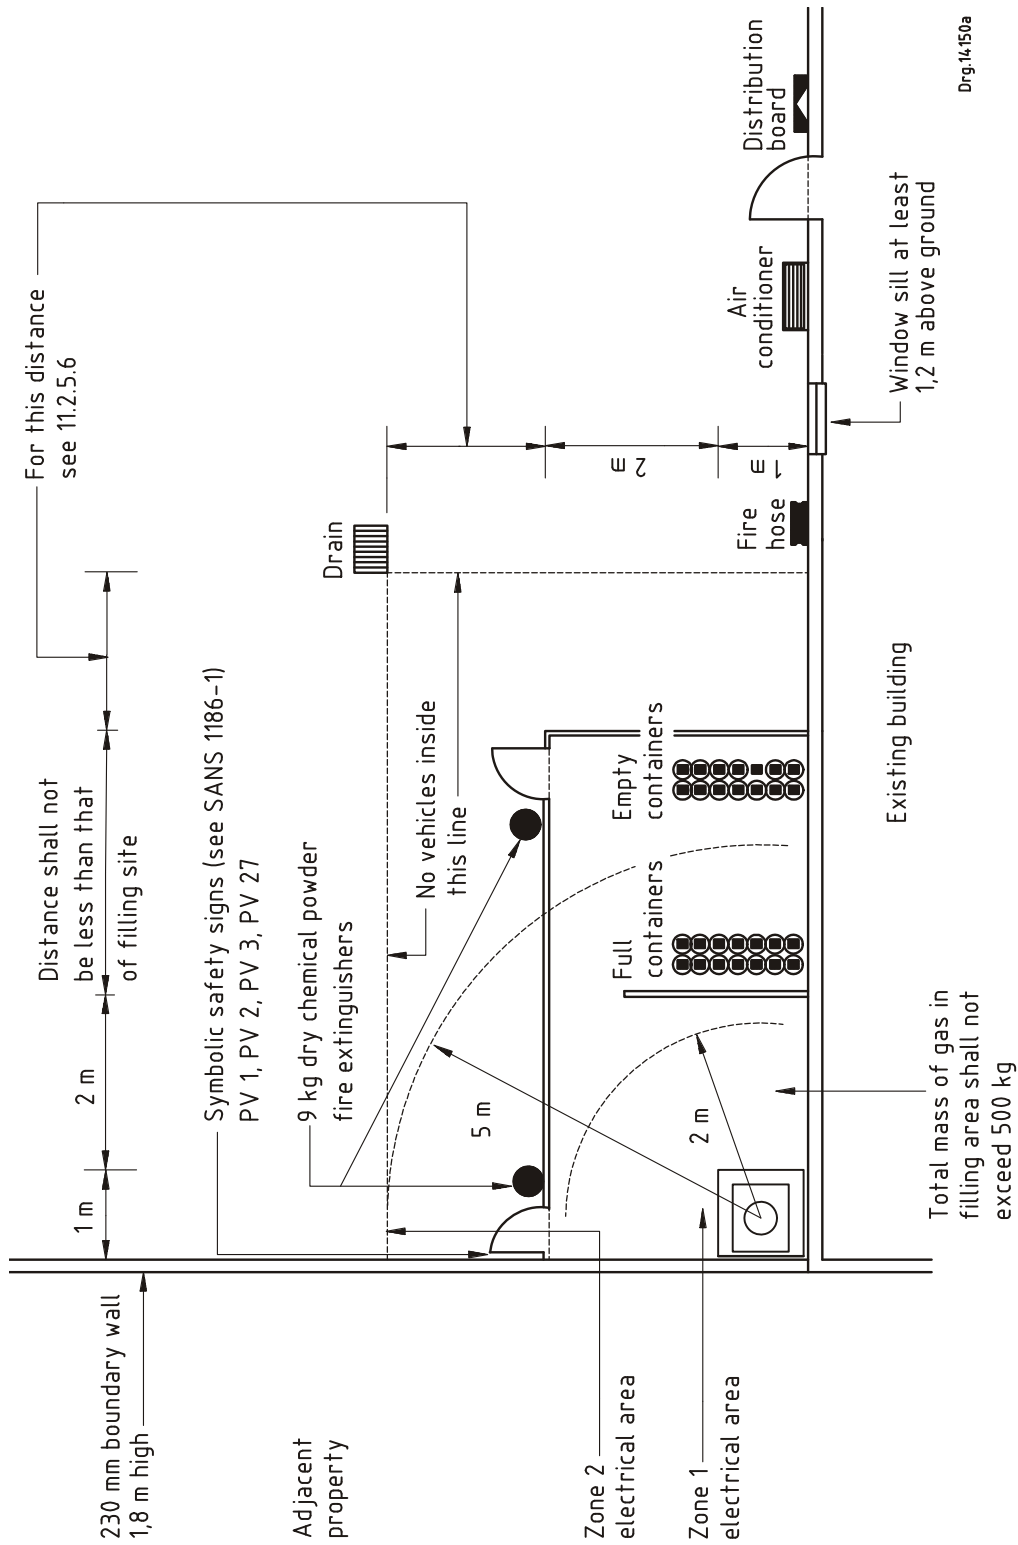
Combined filling area and storage area for LPG containers (against boundary wall)
